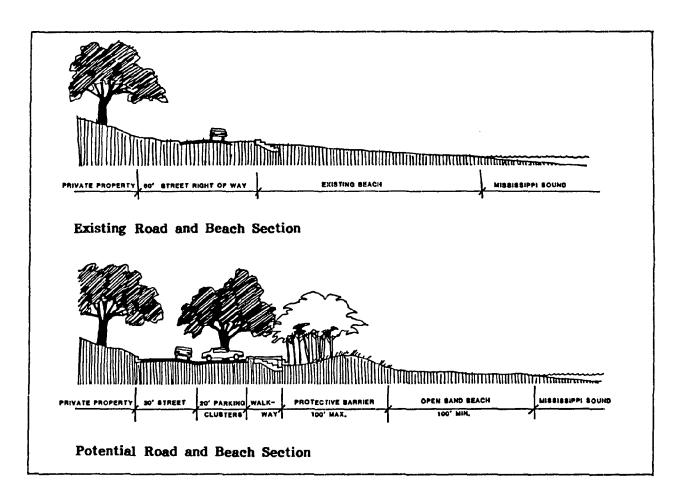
EXISTING AND POTENTIAL ROAD AND BEACH SECTIONS
